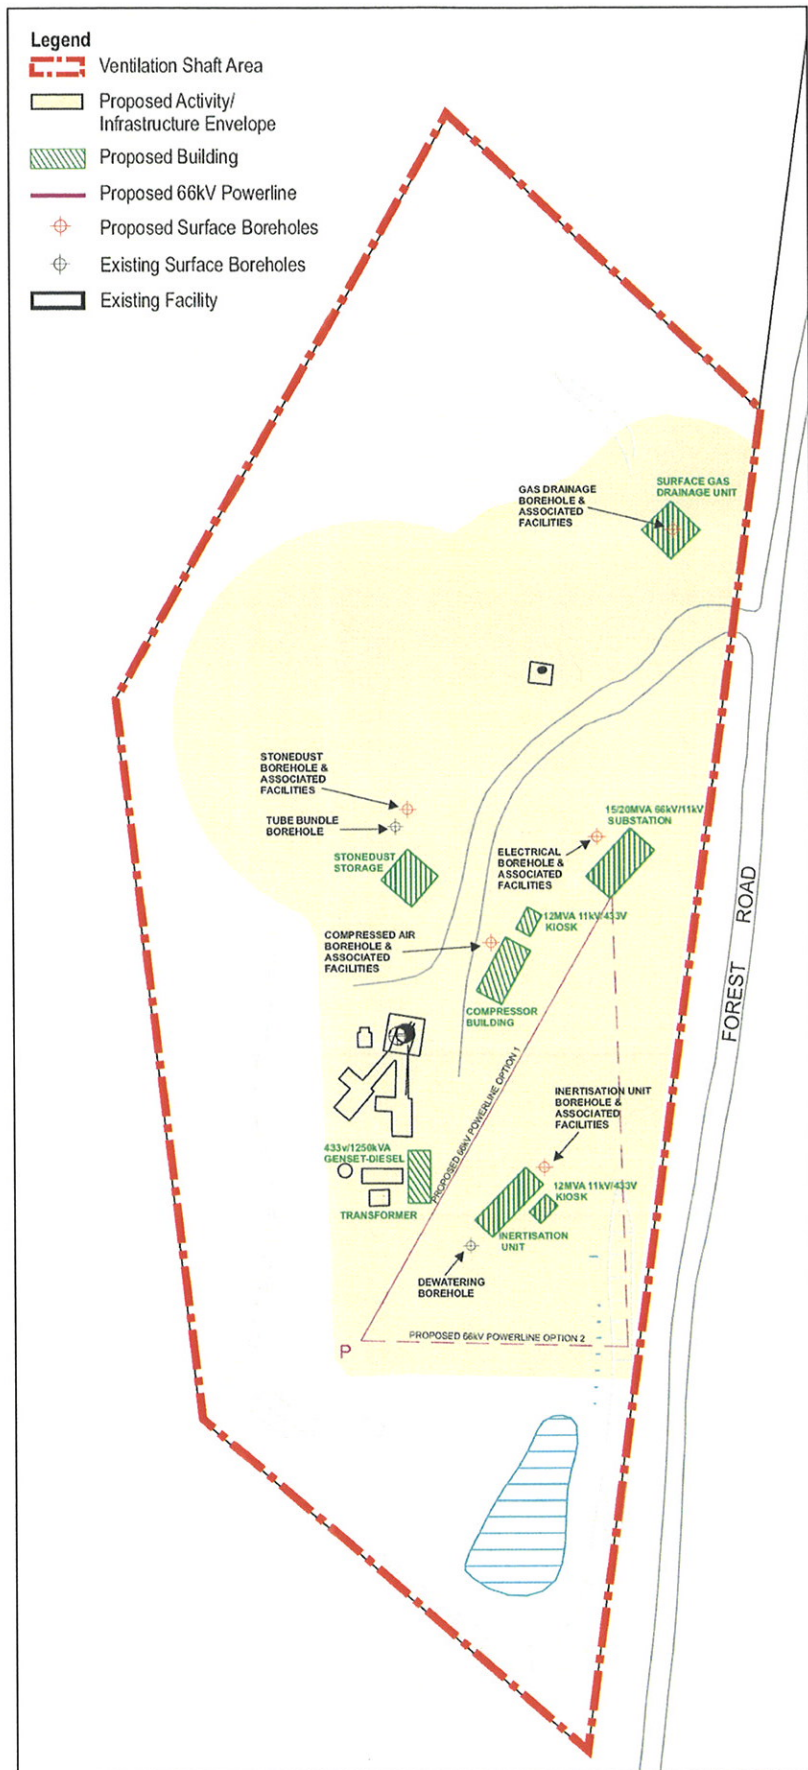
Existing and Proposed Infrastructure at the Ventilation Shaft Area
